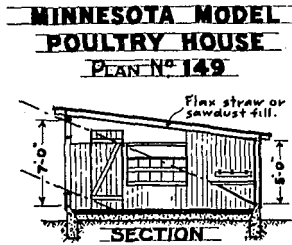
Minnesota Model Poultry House, Plan No. 149
